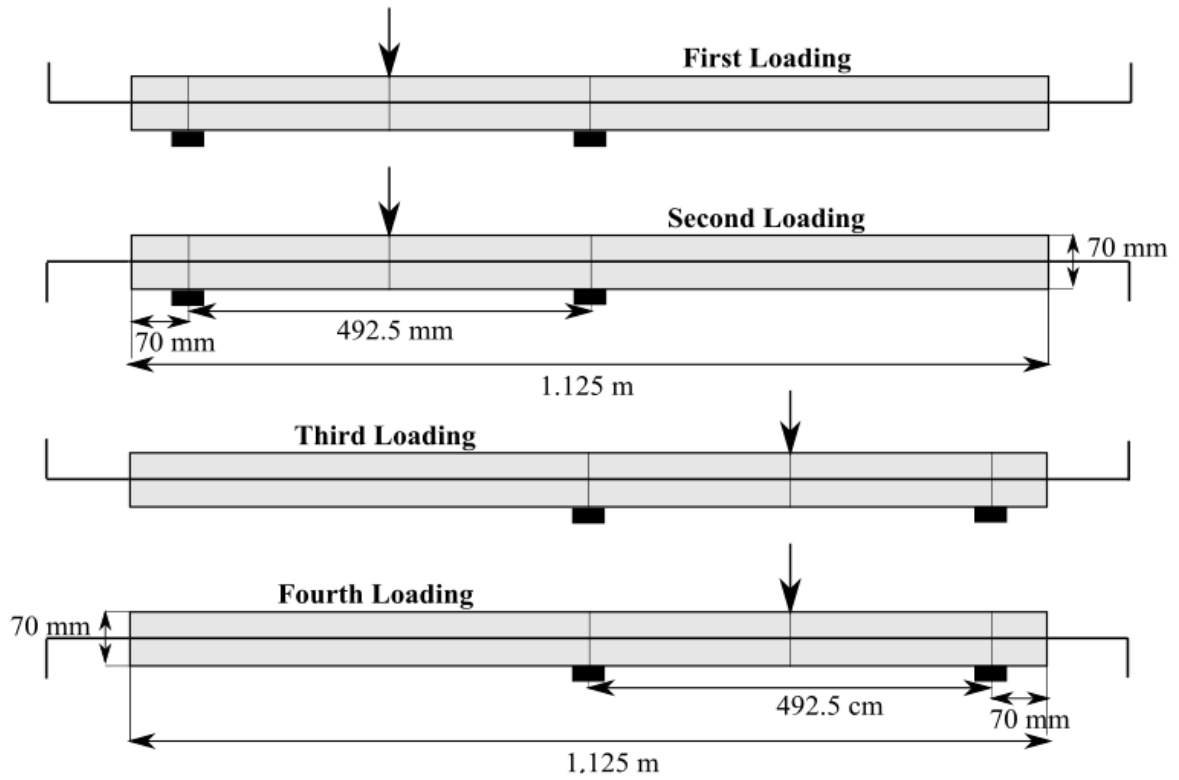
Trial beam damaged concrete section loading procedure
